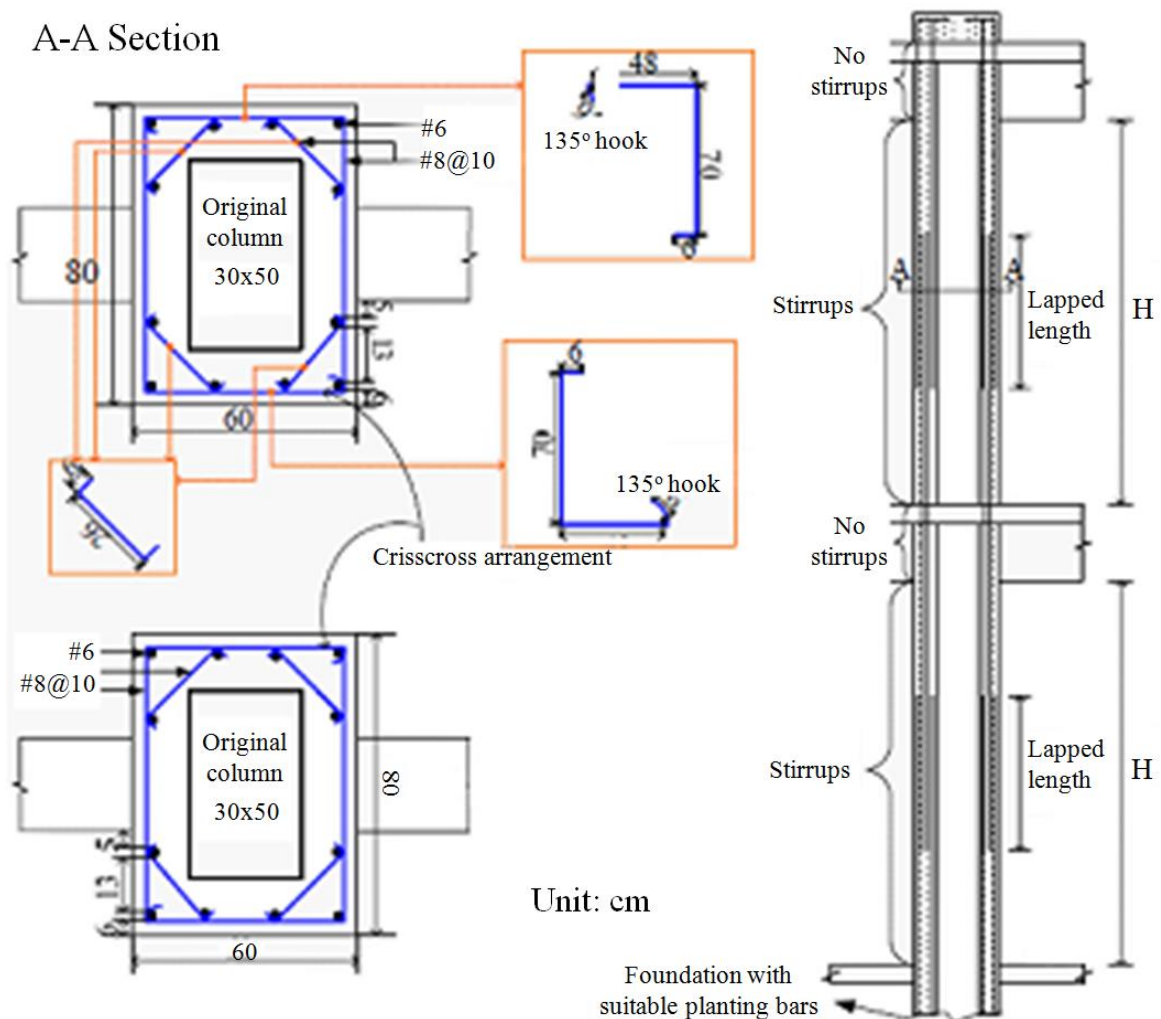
Design of RC jacketing reinforcement method (Chung, et al., 2009)
